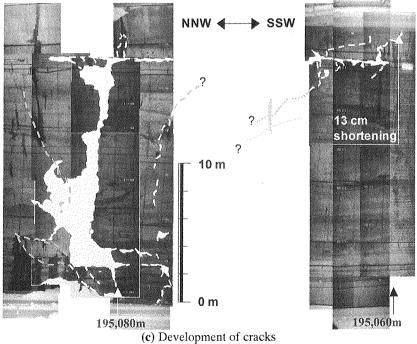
Cracks in the southern part of the damaged segment of Uonuma tunnel (195,060-195,080 m)
